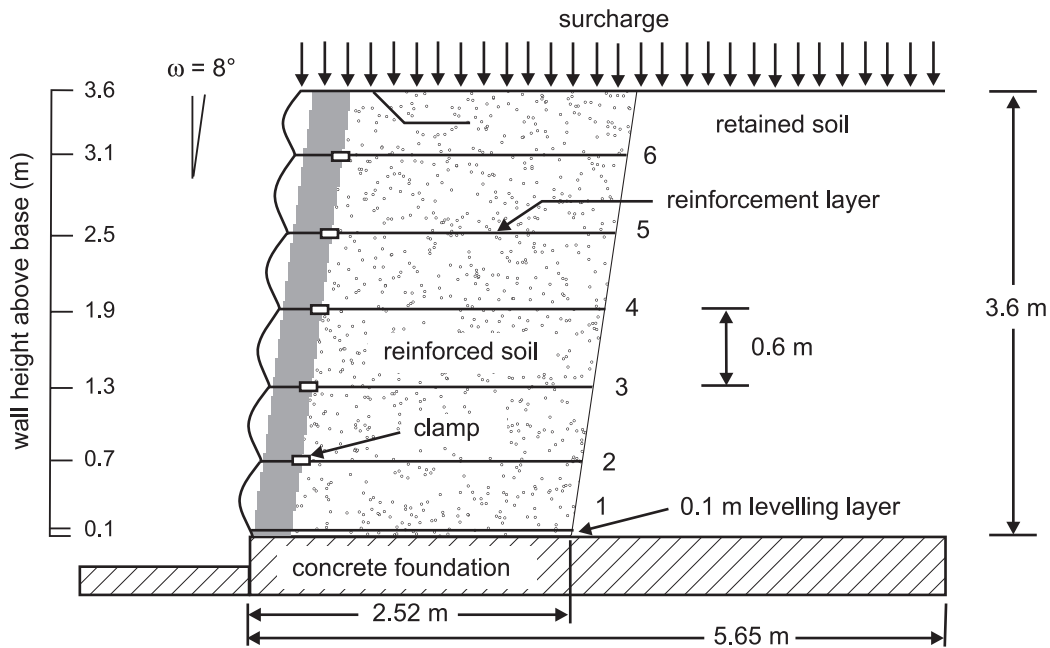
Cross-section of flexible wrapped-face reinforced soil retaining wall.
